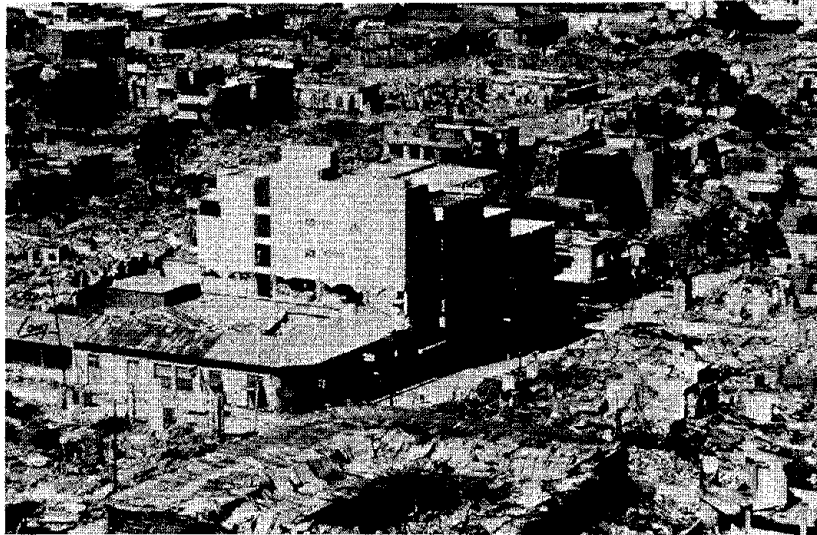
Exterior Wall Failure at Floor of Building Subjected to Banging by Adjacent Lower Building
